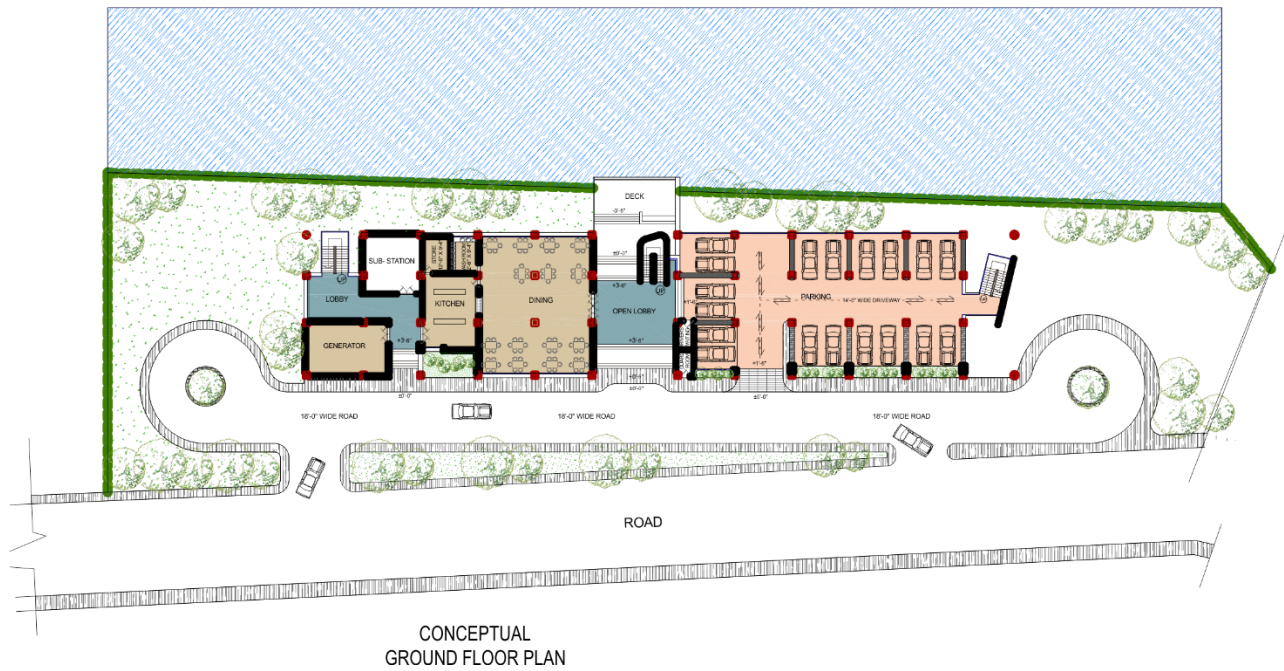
Proposed Layout Plan of Budget Hotel at Char Montaz
